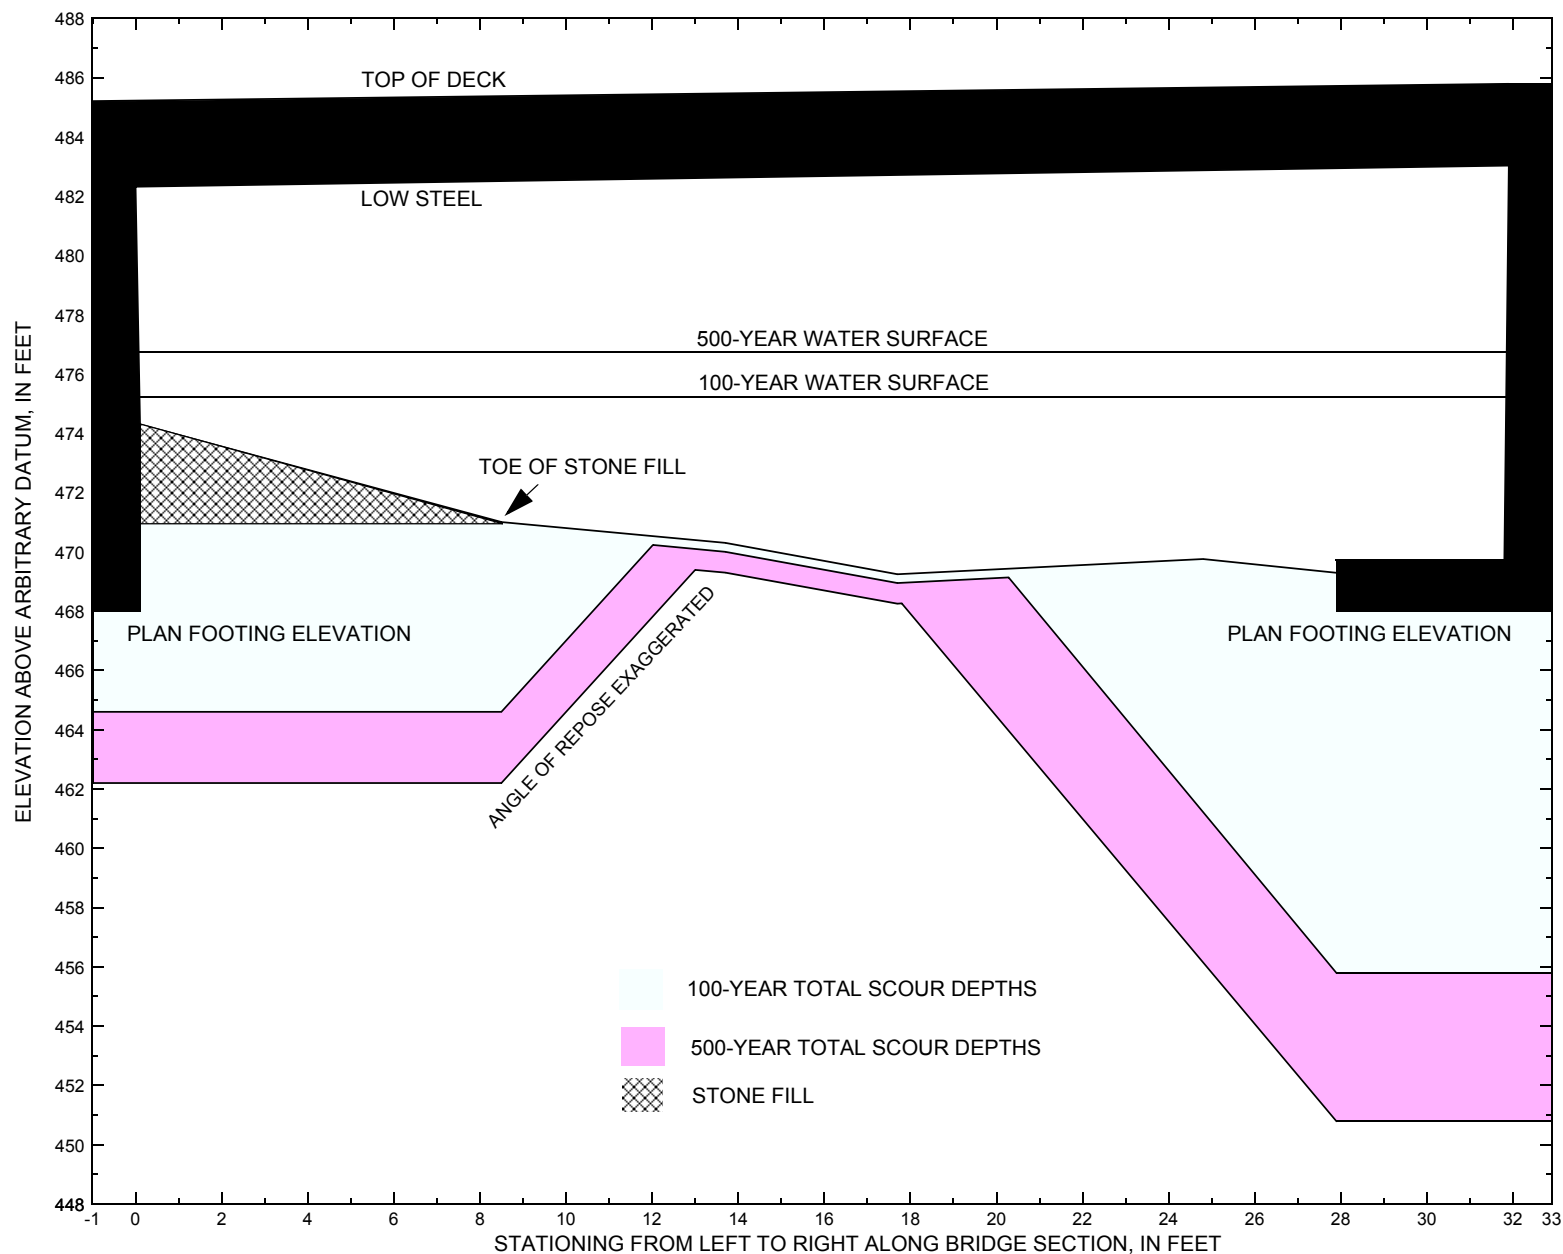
Scour elevations for the 100- and 500-year discharges at structure SHRETH00060032 on Town Highway 6, crossing Sargent Brook, Shrewsbury, Vermont.
